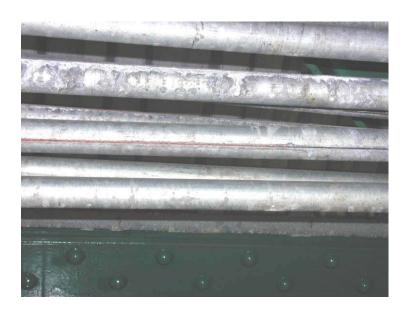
Conduit, Span 1 – note longitudinal crack/split
